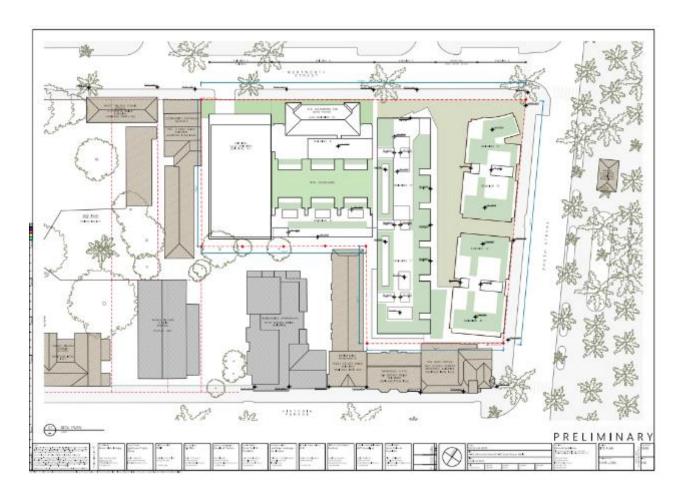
Plan showing additional roof top landscape zones (plan extract S75W - 1060)
